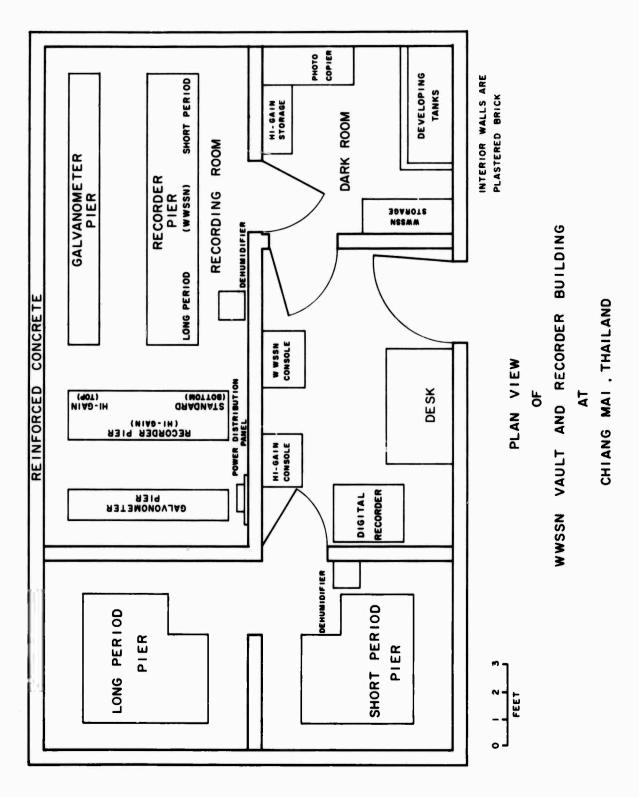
Plan of existing WWSSN Vault and Recording Building.
